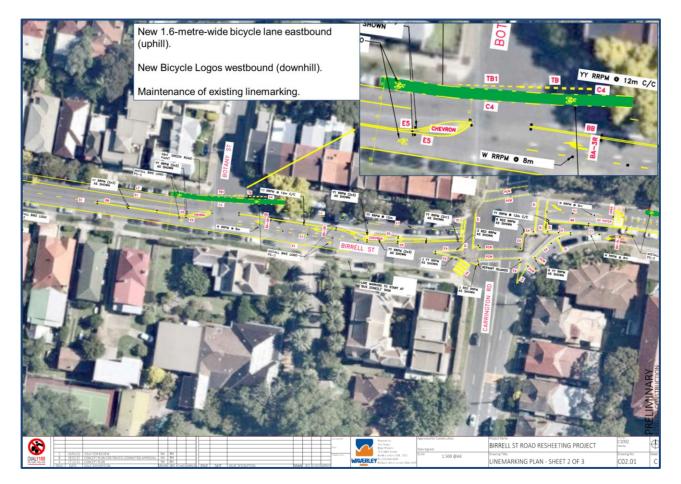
Line marking plan along Birrell Street east of Carrington Road.
